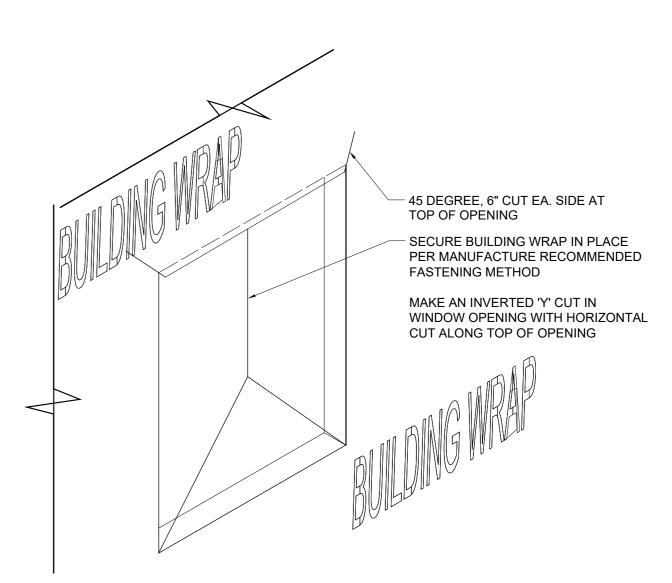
ONLY APPLY WHEN REPLACING NEW WINDOWS, PER OWNERS DIRECTION.
